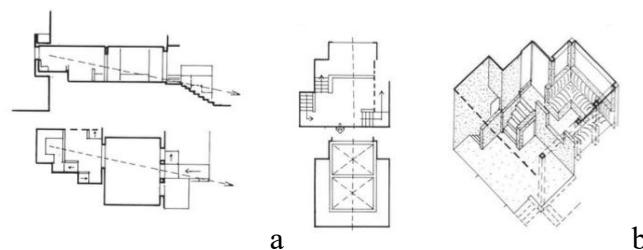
a) Raum Plan, Adolf Loos, Moller house, Vienna, b) Raum Plan _Moller House Adolf Loos
